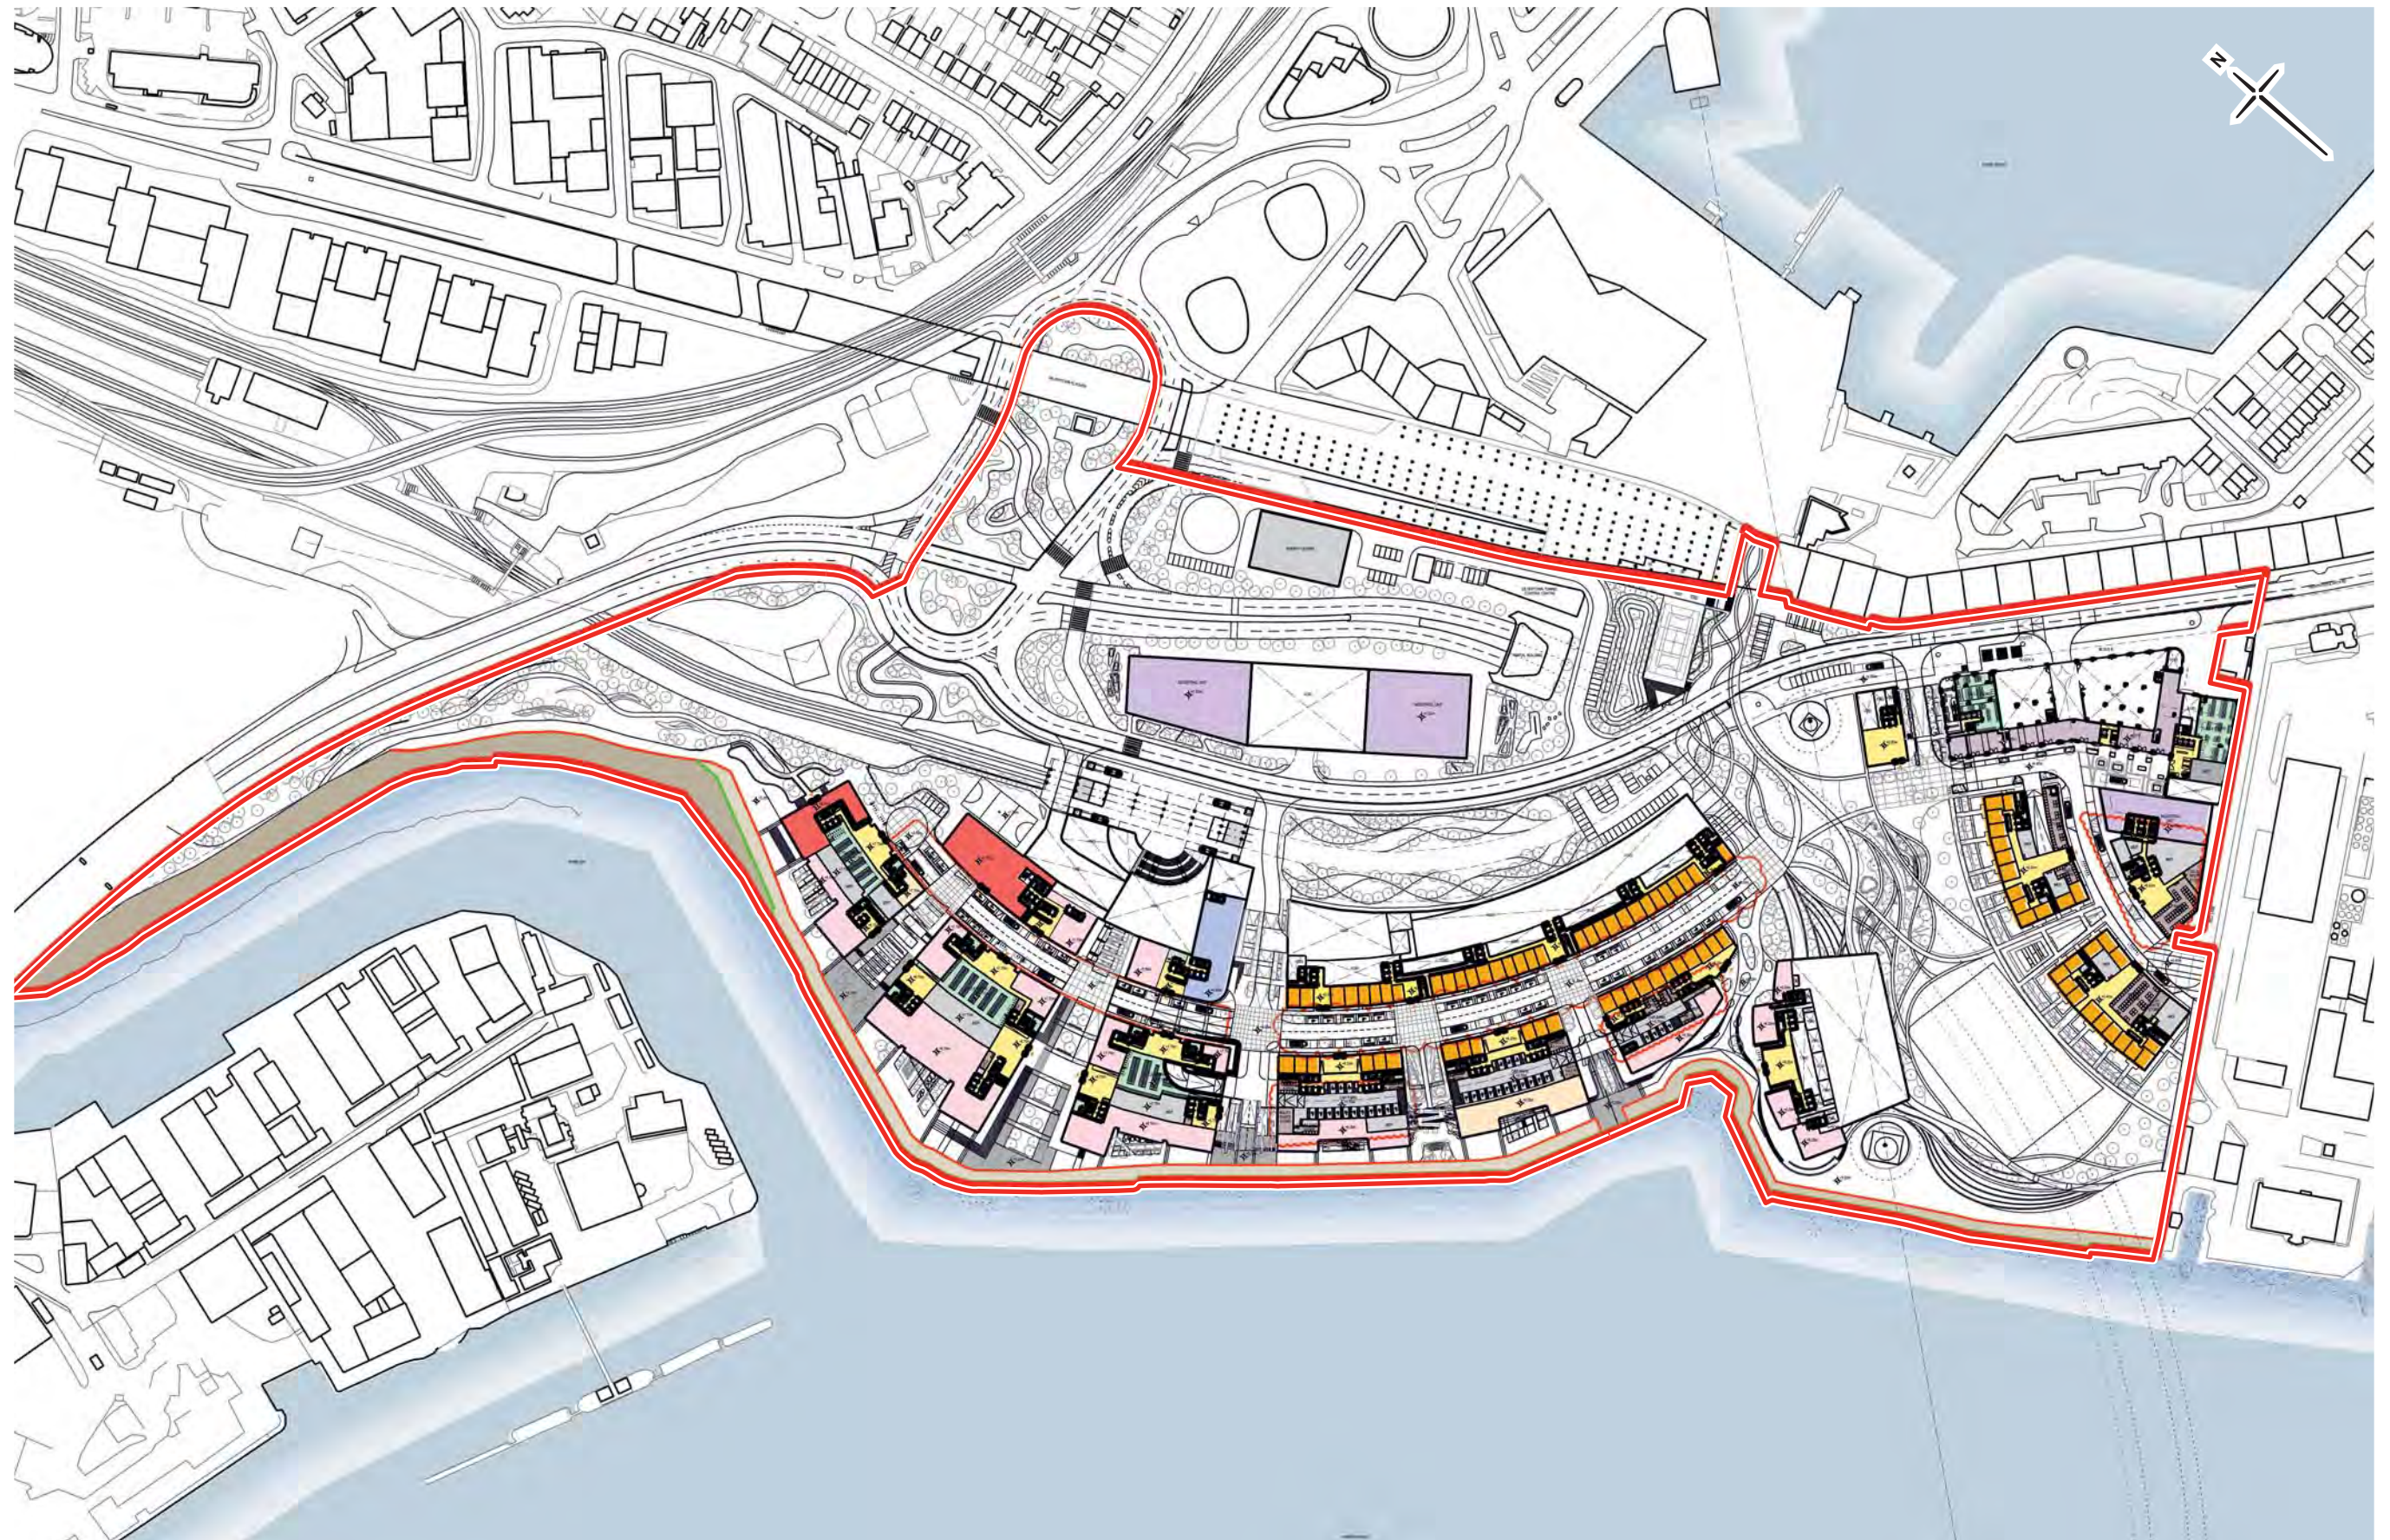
Proposed ground level Site layout (Foster + Partners, Site Layout Masterplan Ground Level, dwg 2693 A-SL-011-01-01, Rev 00, 17/02/2020)
